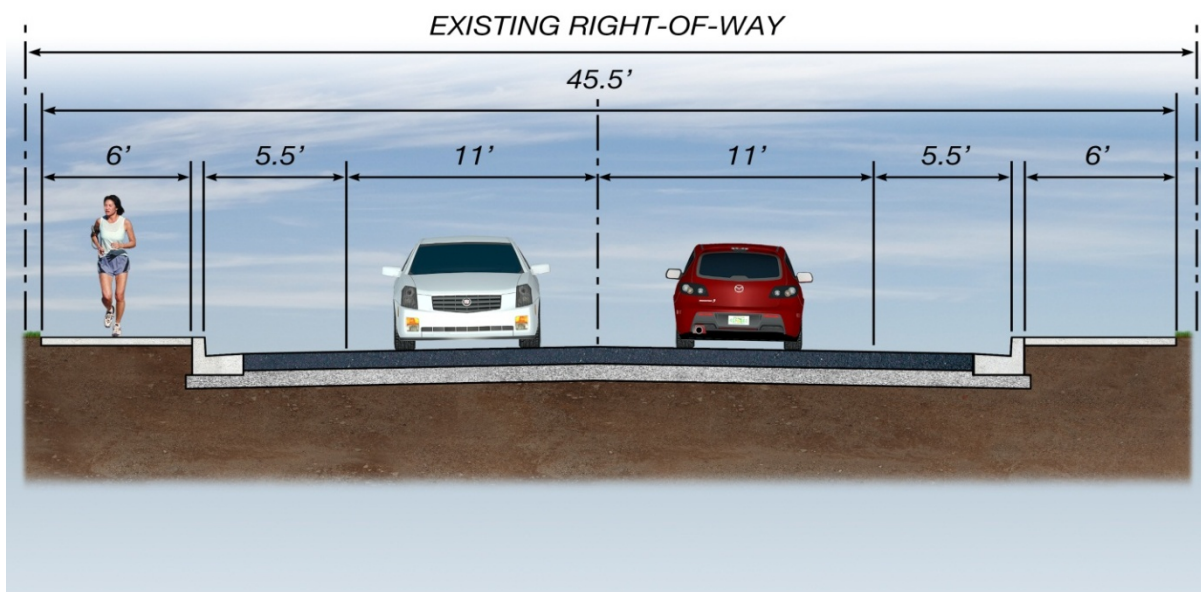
Proposed Roadway Section East of Proposed Movable Bridge
